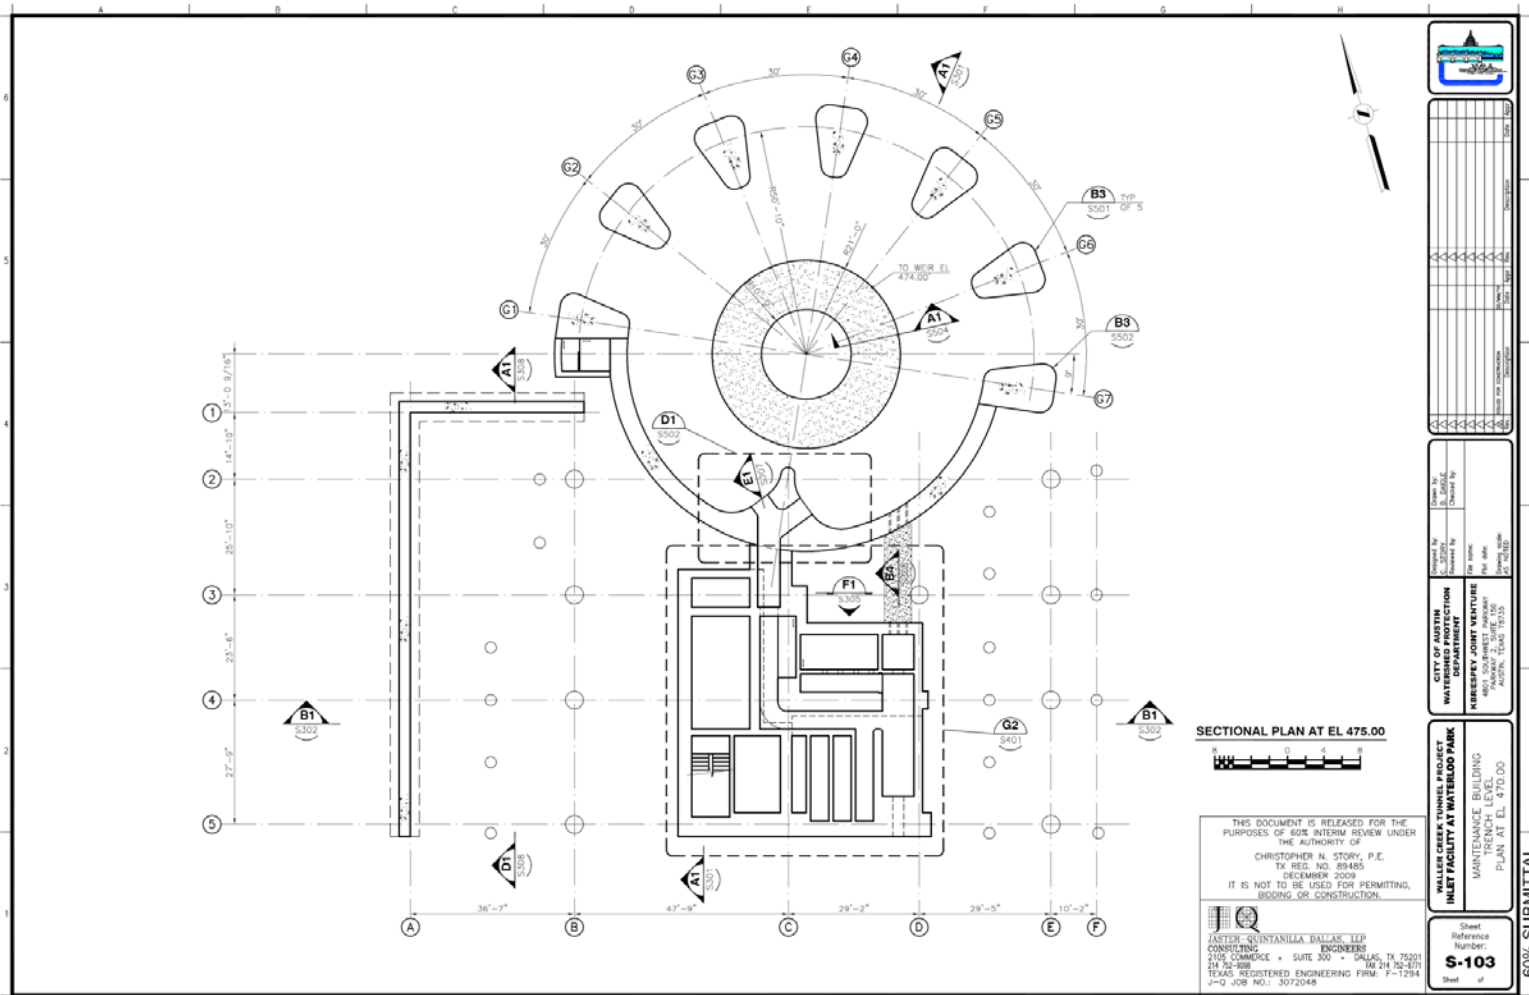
Waller Creek Tunnel Project; Morning Glory Spillway – Plan at EL 475
